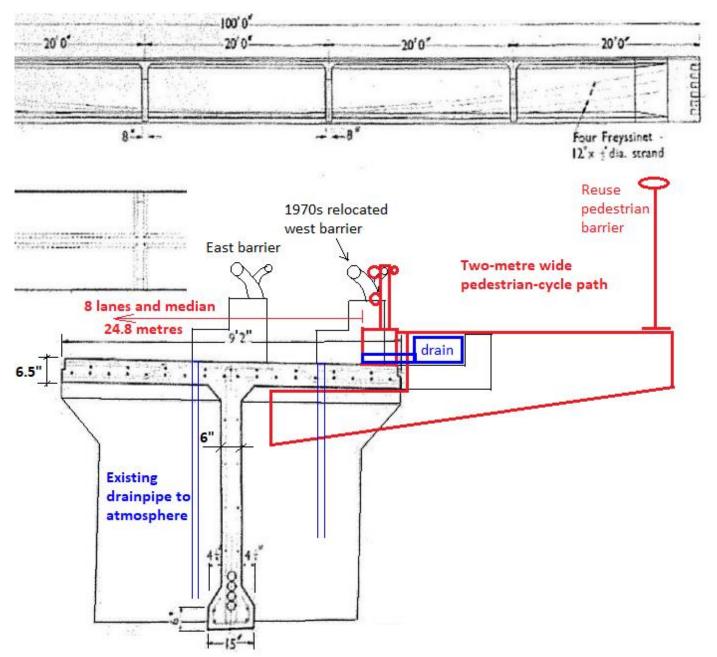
Gladesville Bridge arch at crest – arch has sufficient width to support 8 traffic lanes
